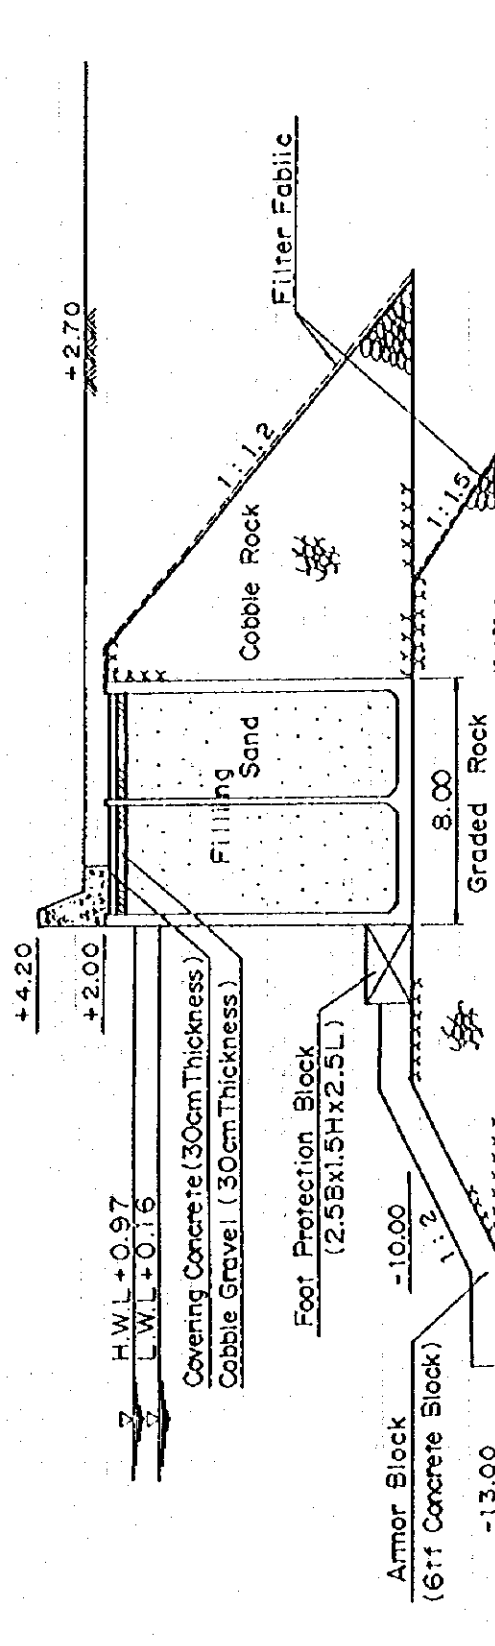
Standard Cross Section of Concrete Caisson Type A Breakwater ⑤
